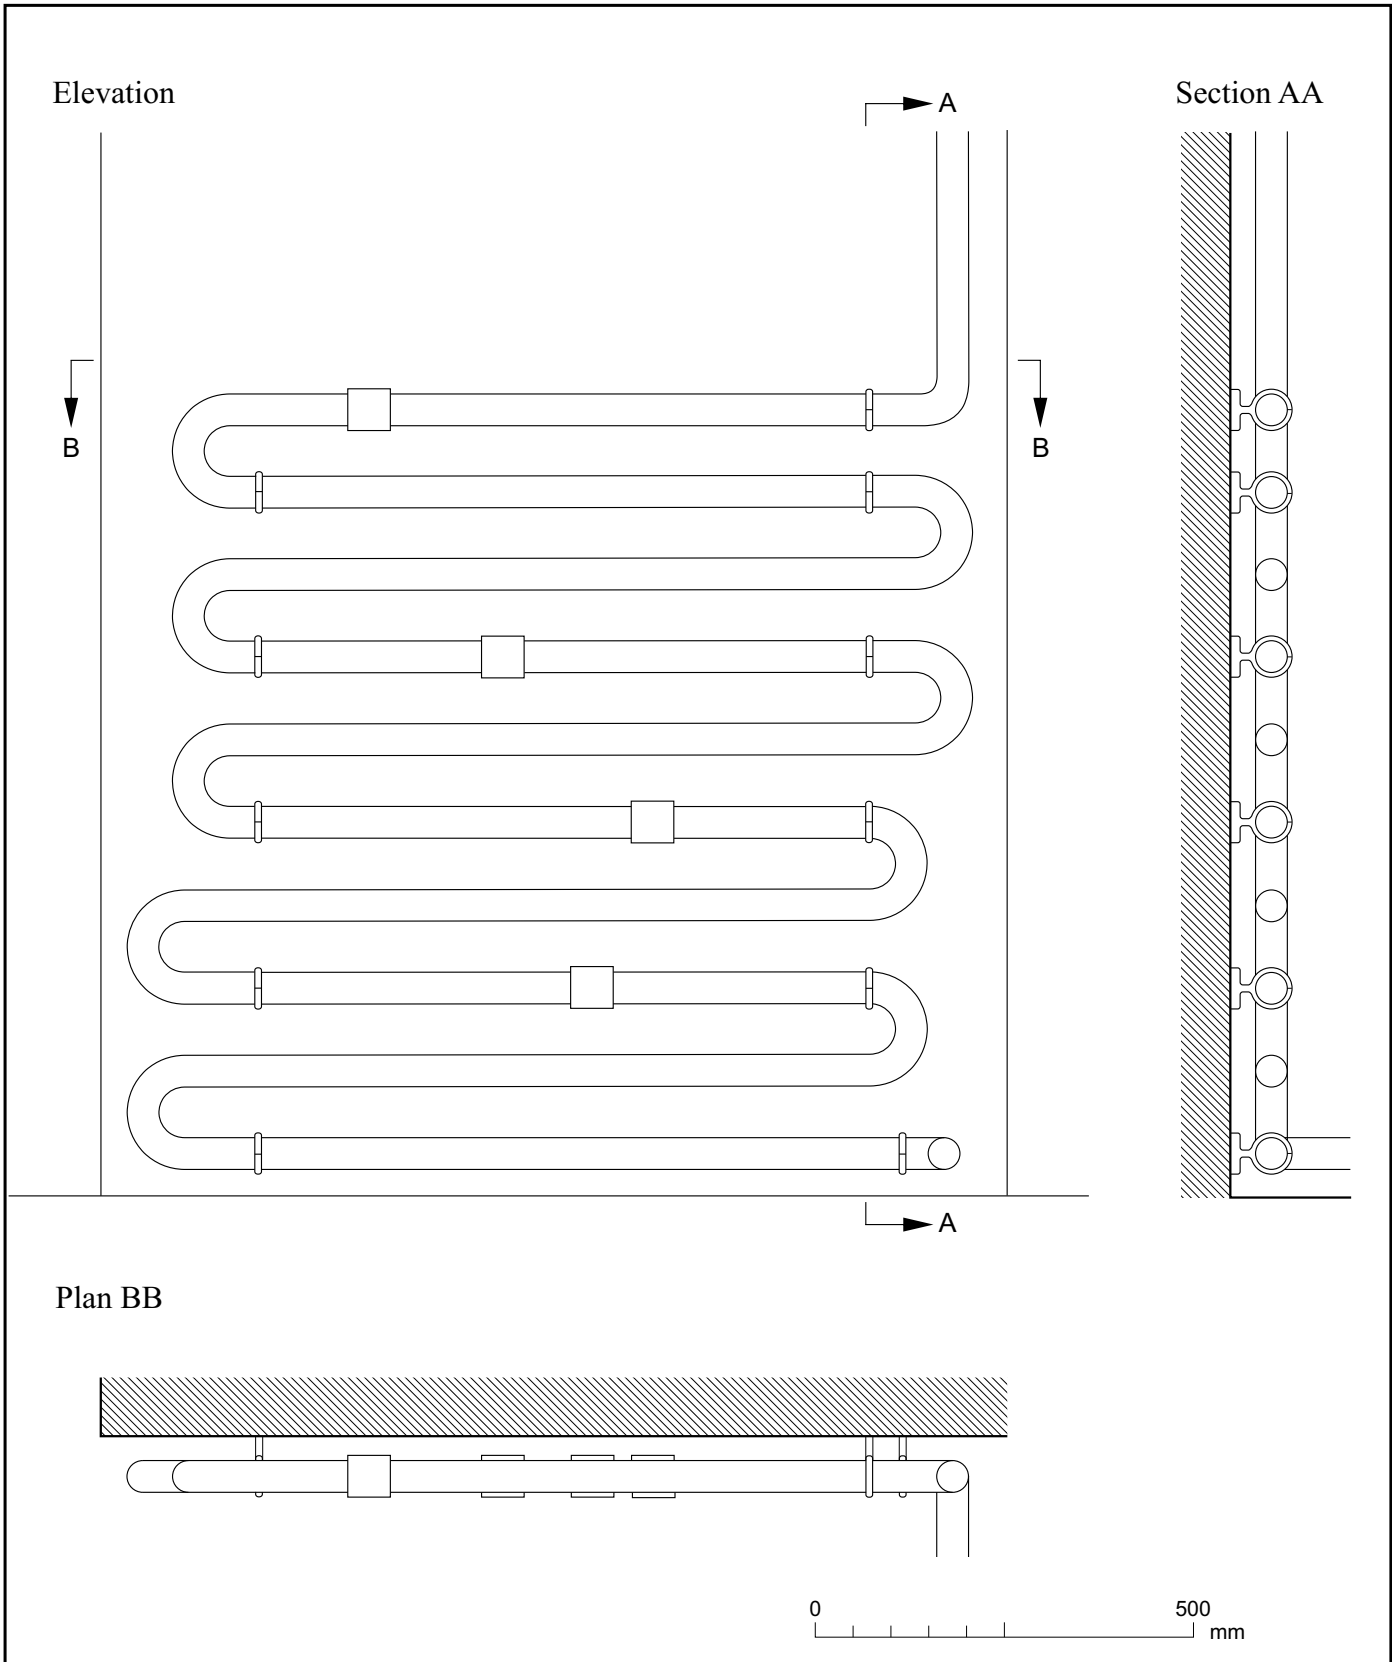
Plan, section and elevation of the coil heater in the tower.
